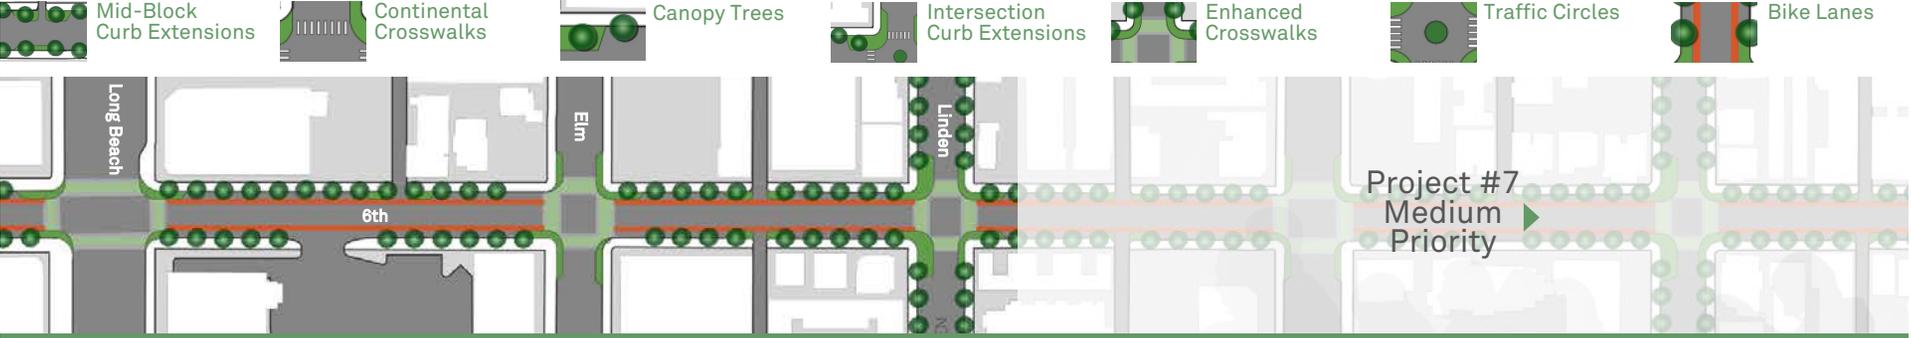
6th Street - Long Beach Boulevard to Linden Avenue
